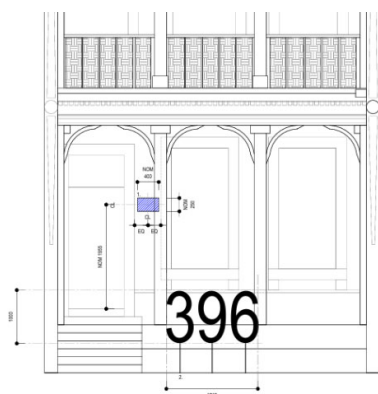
Detail of proposed signage (Studio C+E drawing am 1.01)
